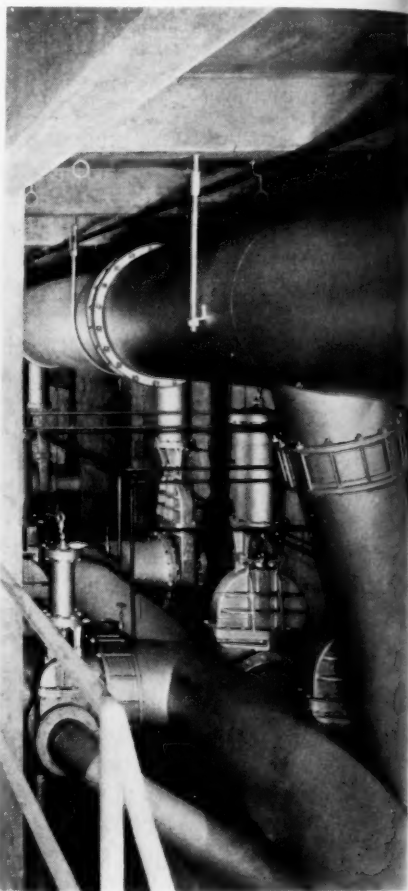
A Typical Filtration Plant Installation Showing Pipe Gallery With Coupled Steel Pipe Connection
